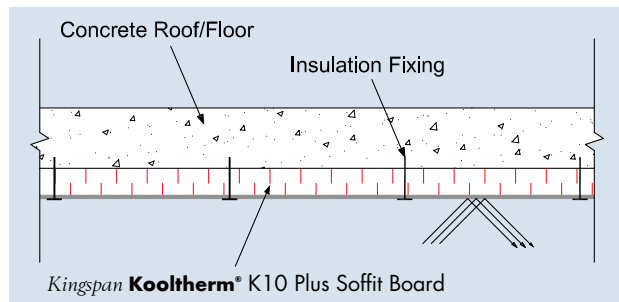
Side elevation - Concrete Soffit with Kingspan Kooltherm® K10 PLUS Soffit Board
